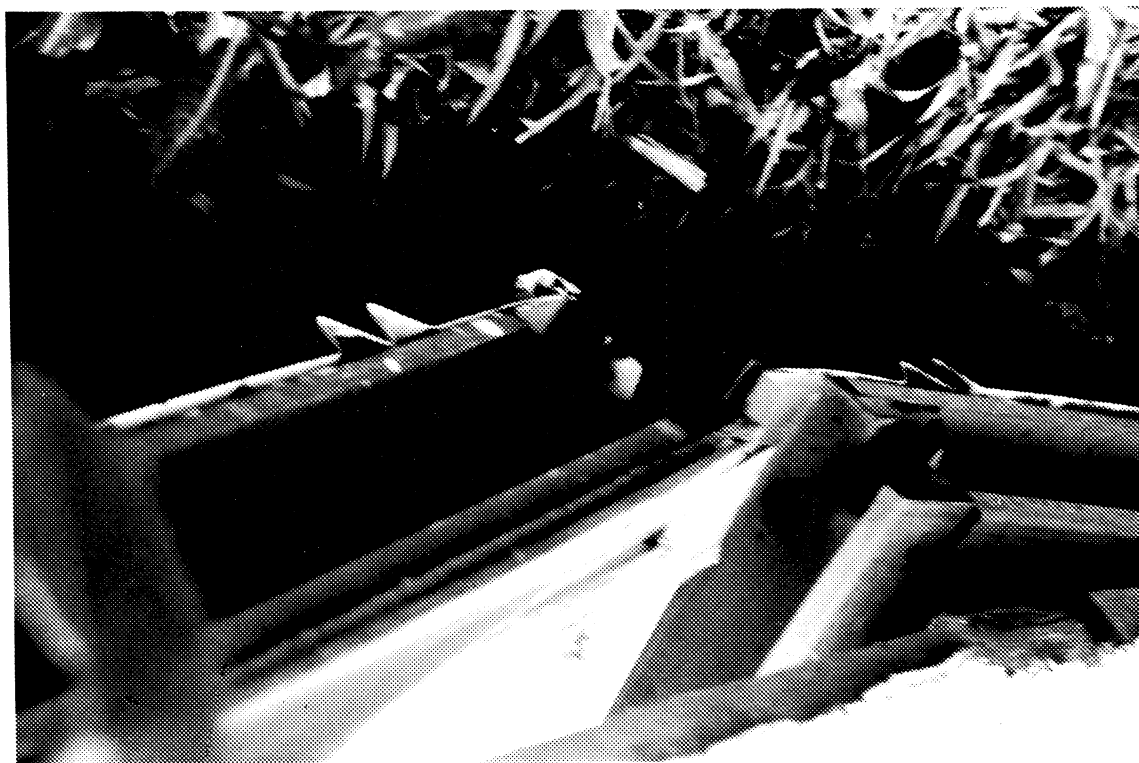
Detail of failure between top of walls and purlins. Note holes in top of mullions are torn.
